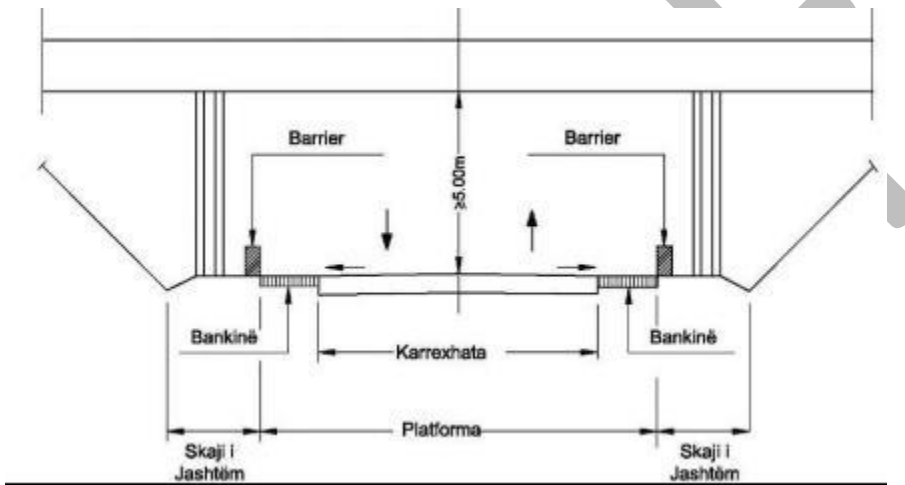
Cross-section of a typical underpass according to ARDM, 2015
